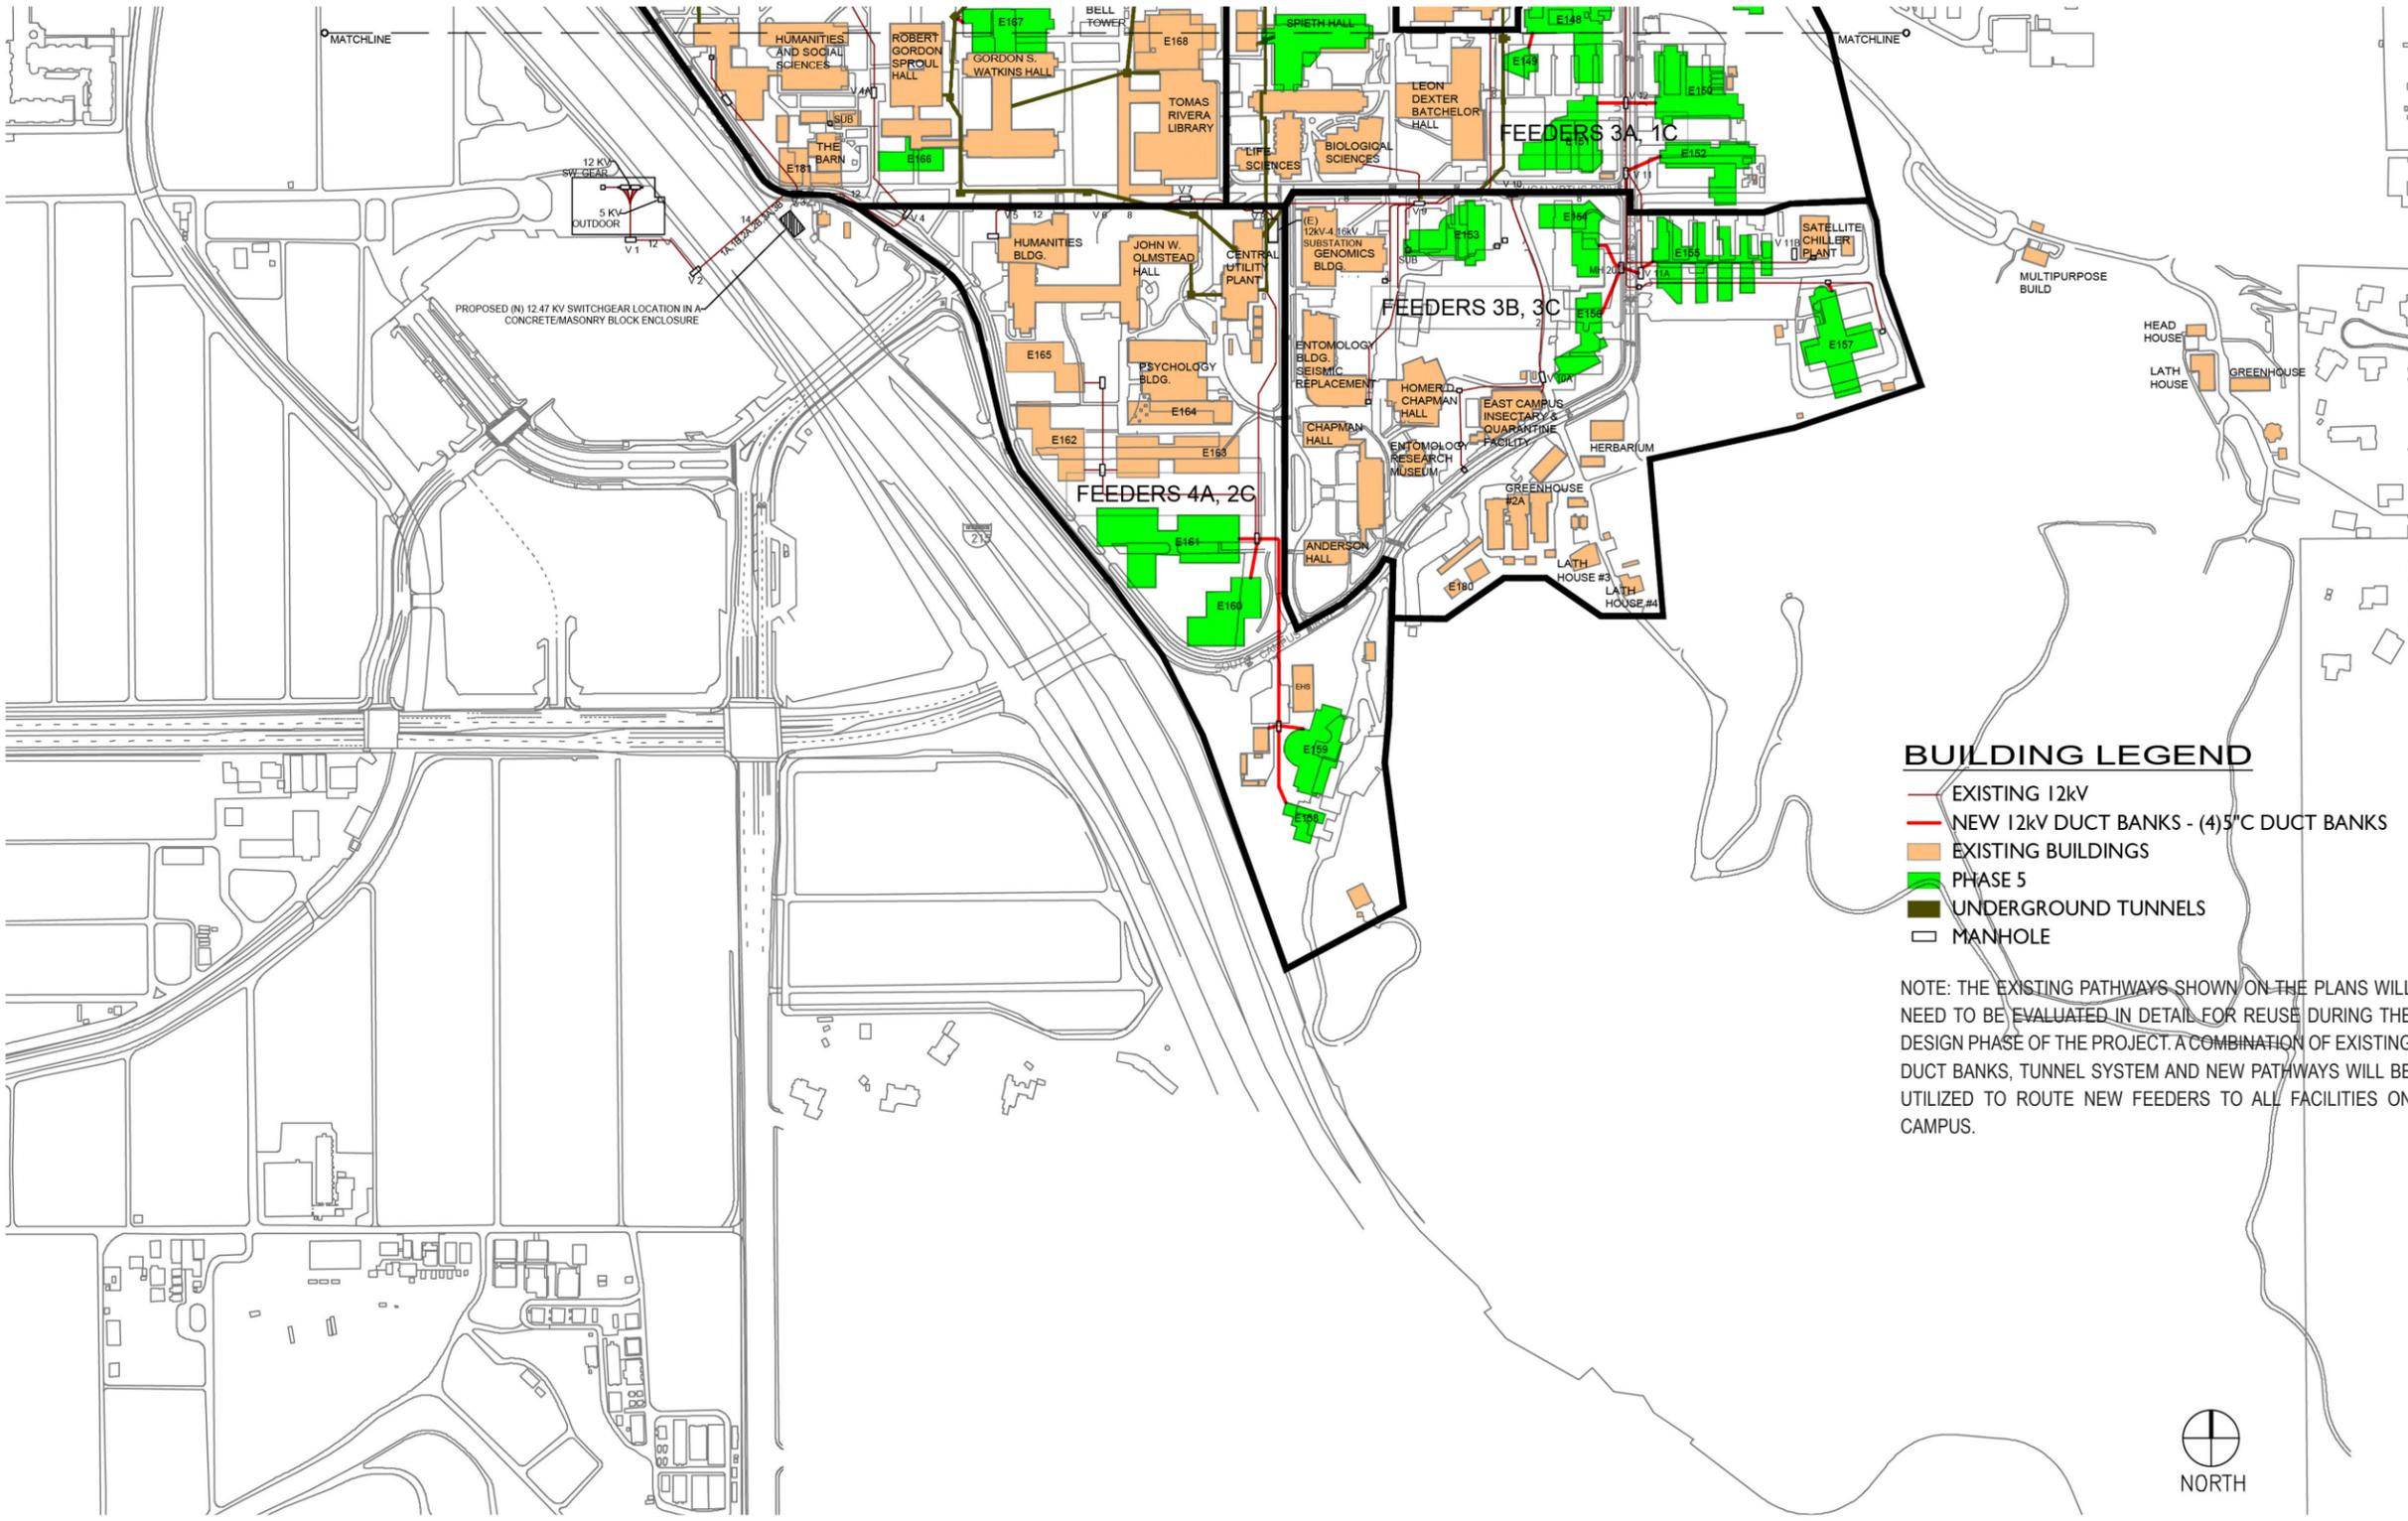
Phase 5 Buildings Electrical Site Plan–South
